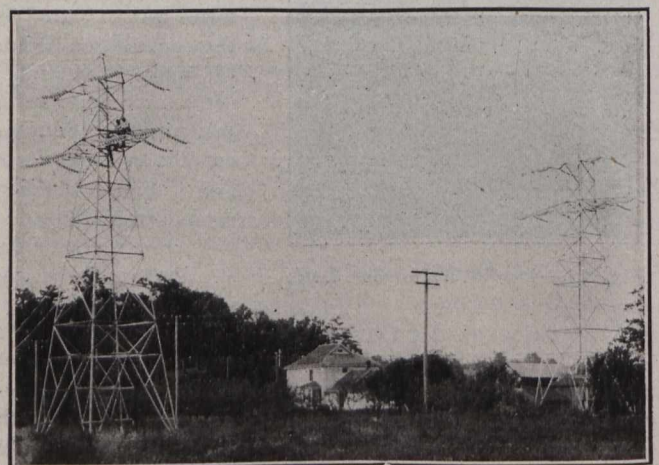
Cable Splicing on Heavy Anchor Tower.
